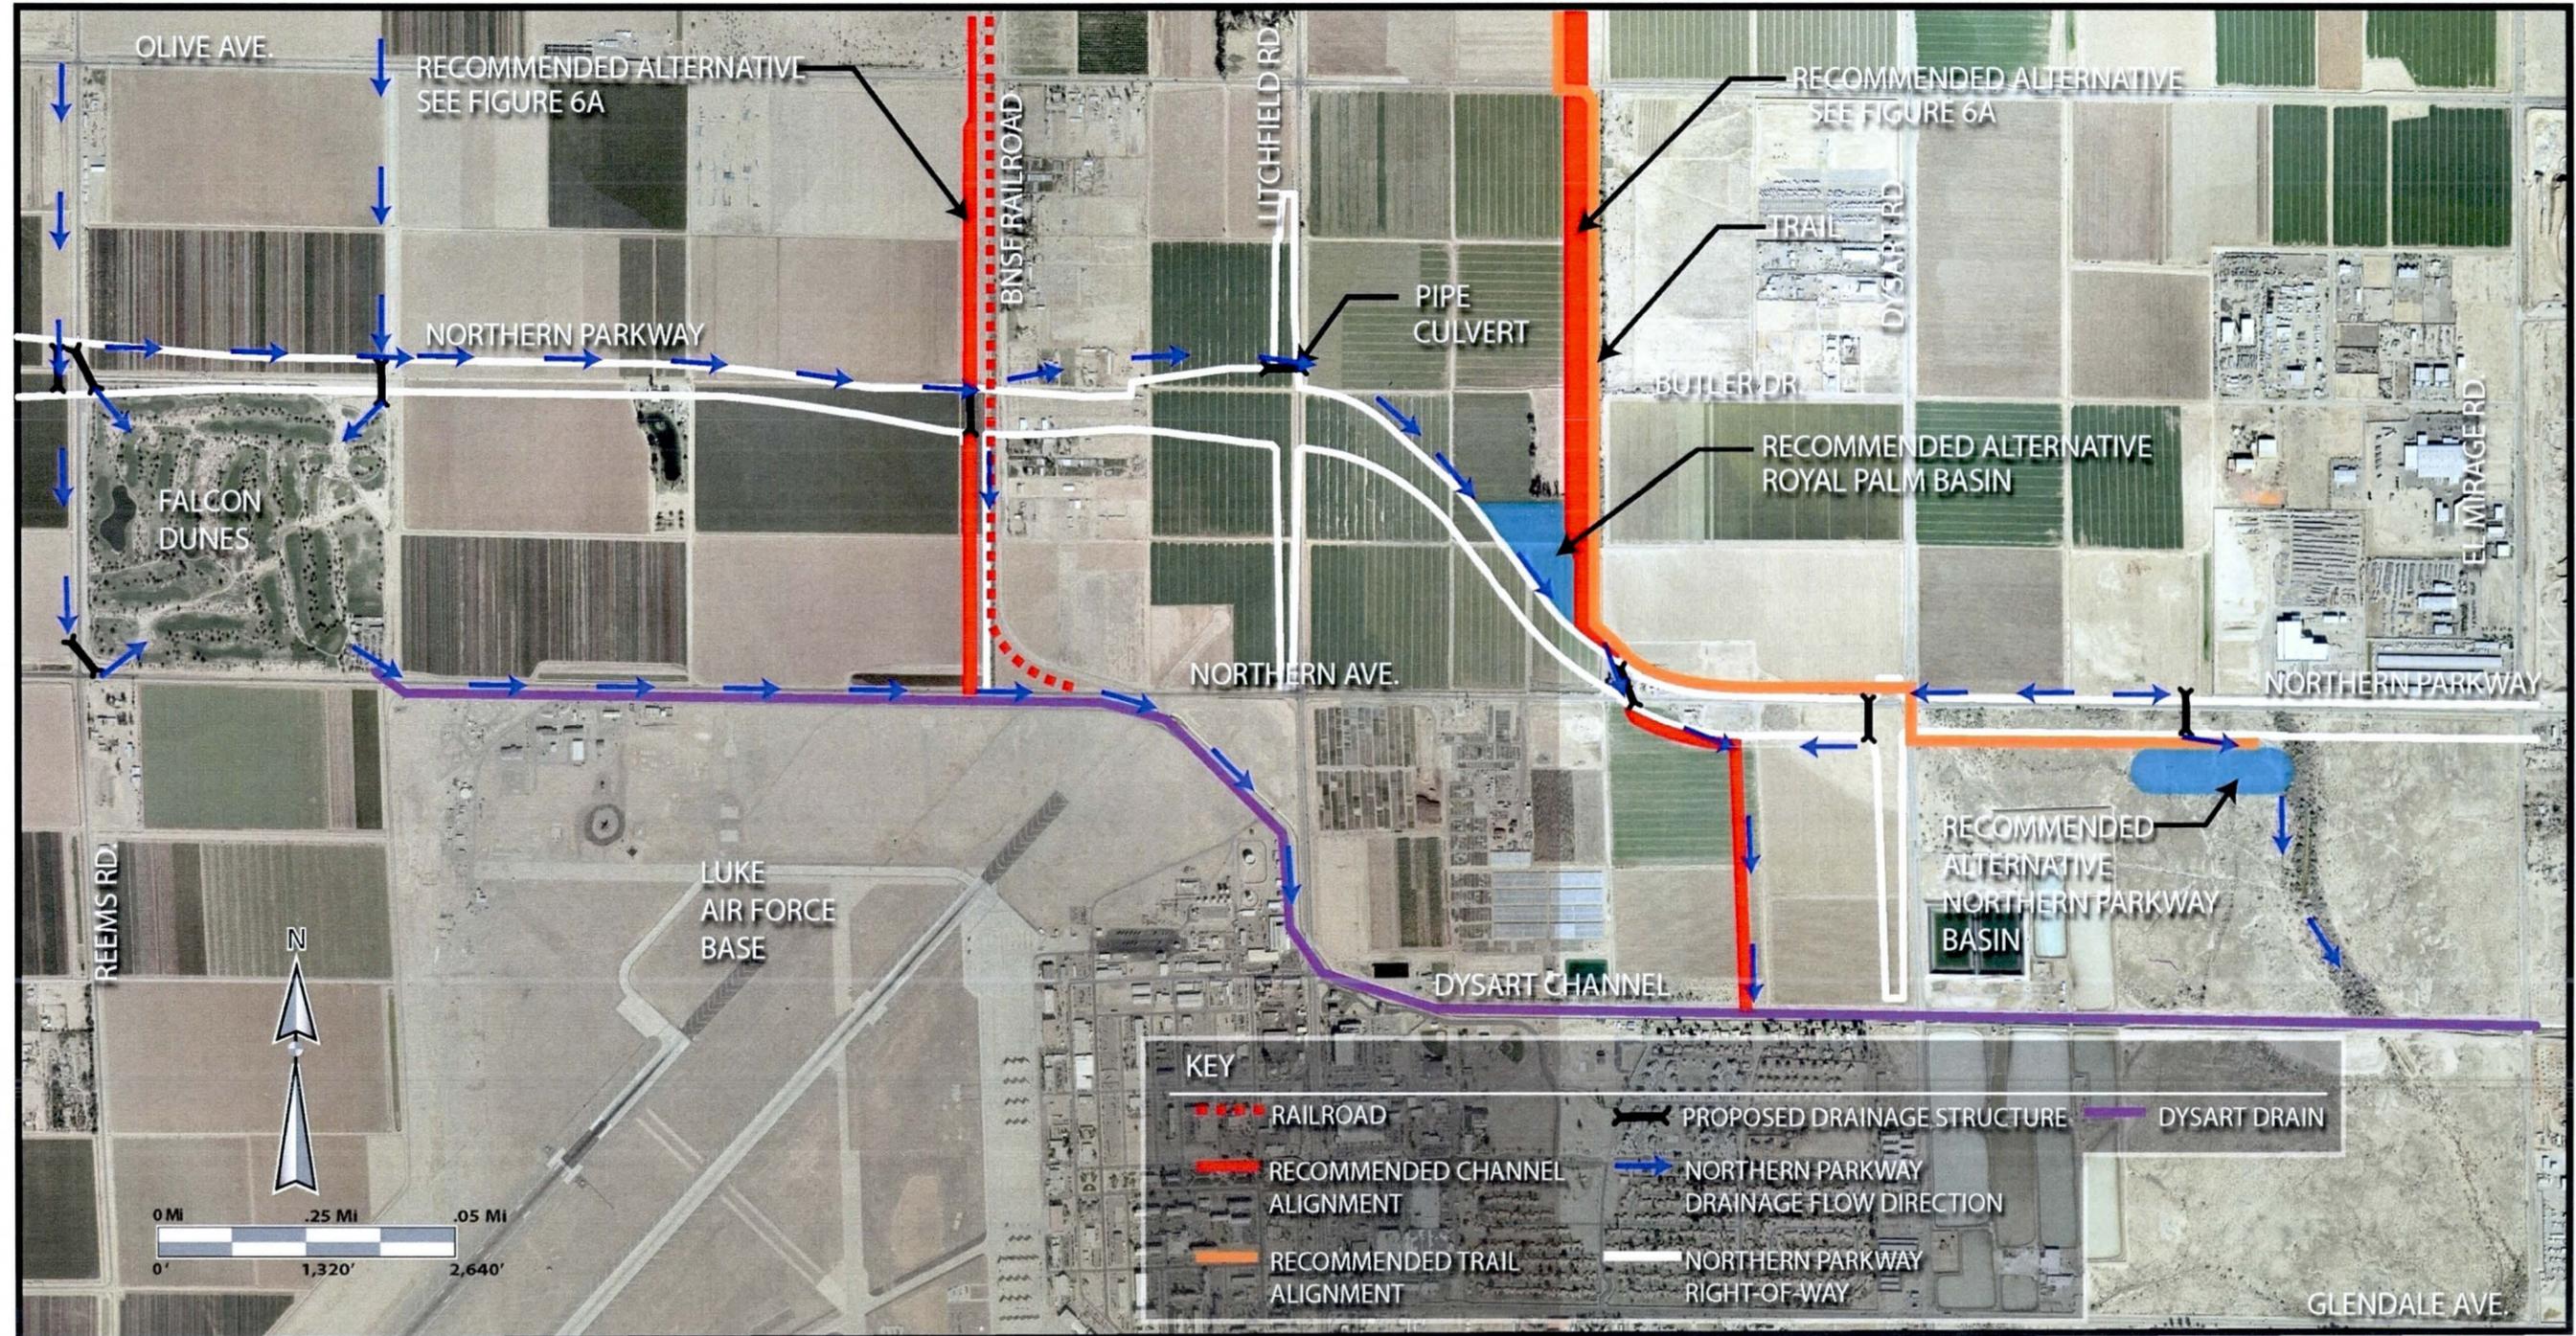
Northern Parkway Drainage Concept with Recommended Alternative
